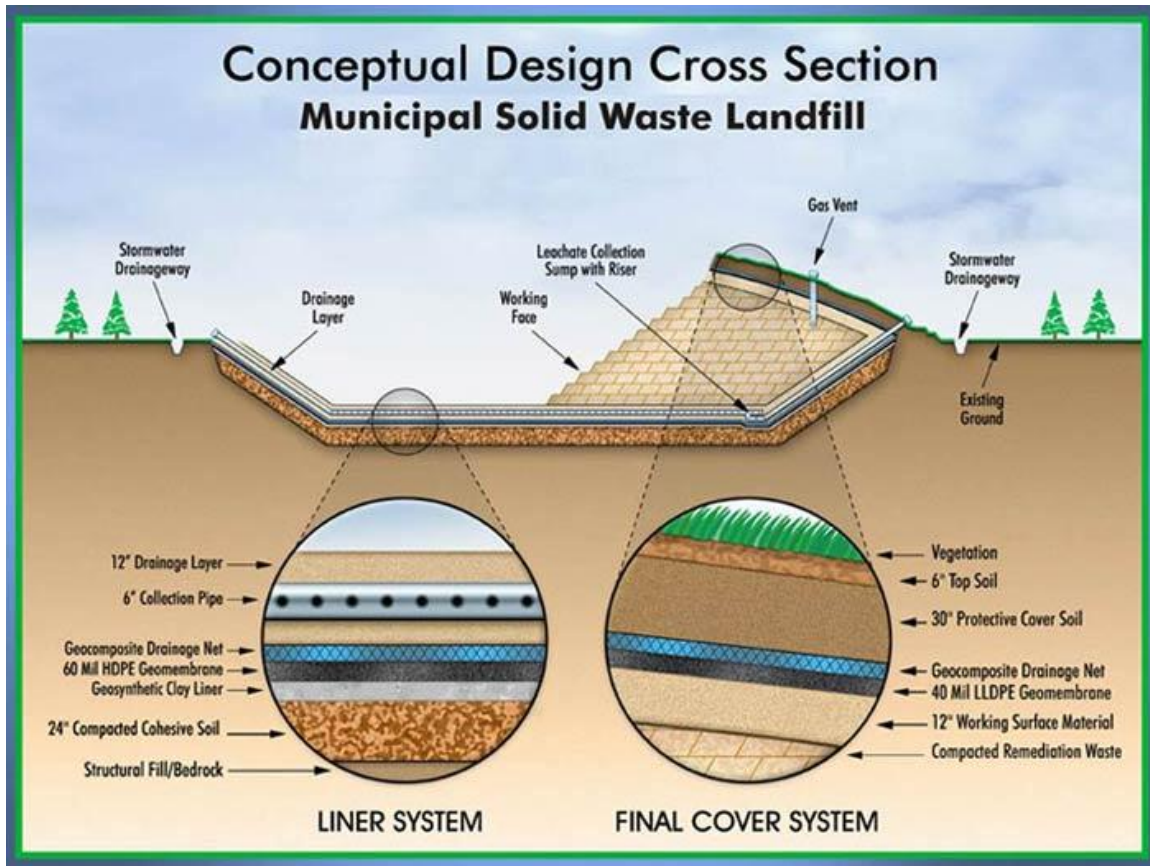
Schematic of Conceptual Landfill Design: Cross Section View
